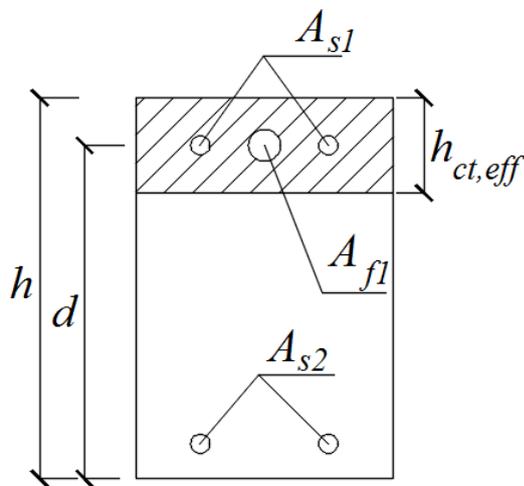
Effective height $h_{ct,eff}$ stretched concrete of the support section of beams with combined reinforcement
